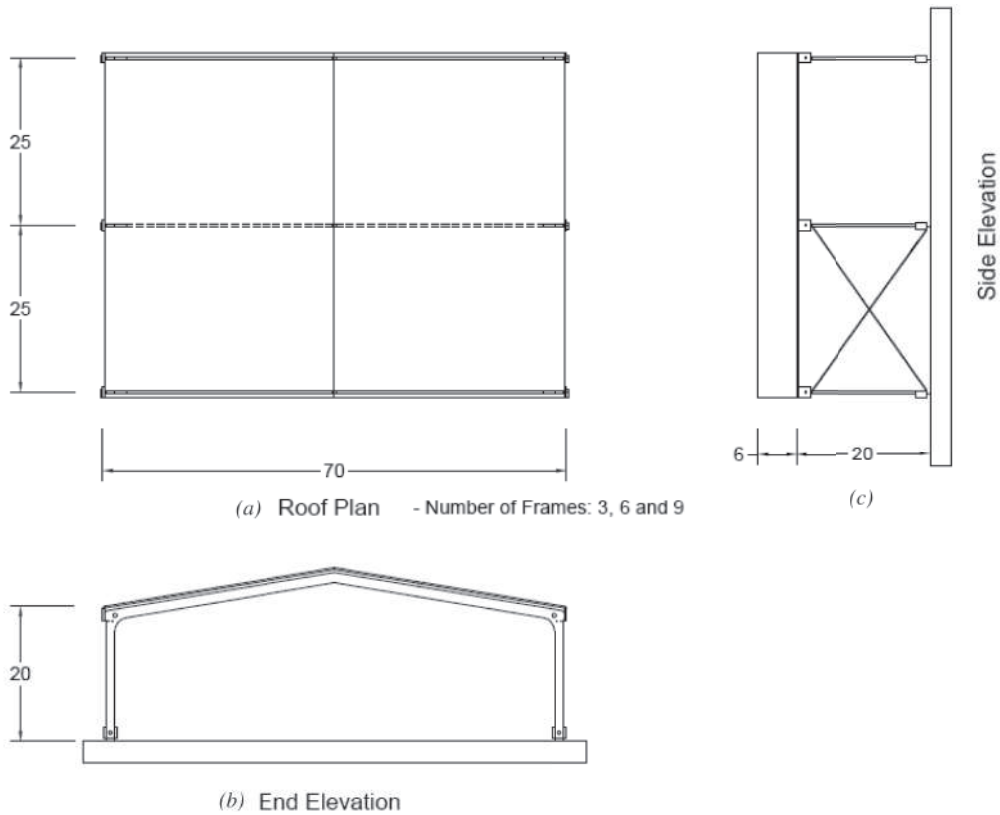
Typical model drawing: (a) roof plan (three, six and nine frames); (b) end elevation showing transverse moment frame; (c) side elevation showing braced frame being evaluated.
